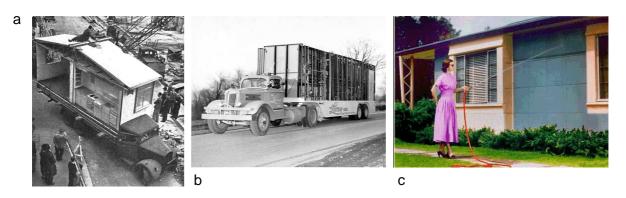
a: Truck transporting the house AIROH, 1945 [7] b: Truck transporting the house Lustron, 1948 [6] c: Exterior house Lustron [6].
